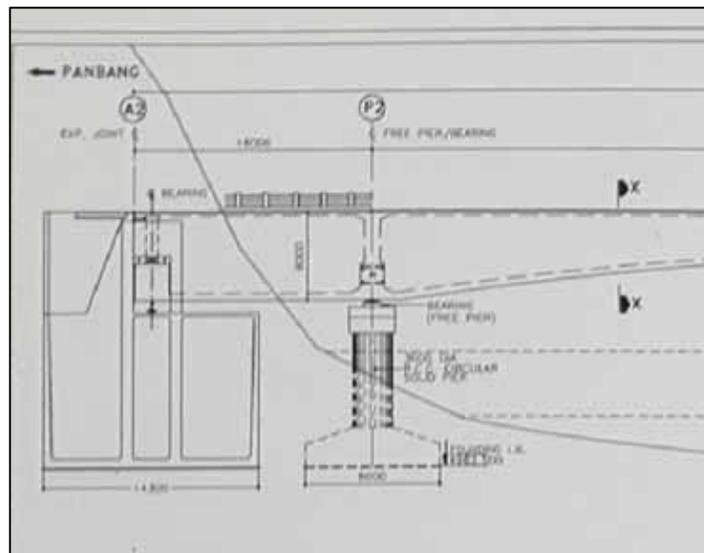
Open foundation design of Pantang Bridge, Zhemgang (CDCL, 2013)
